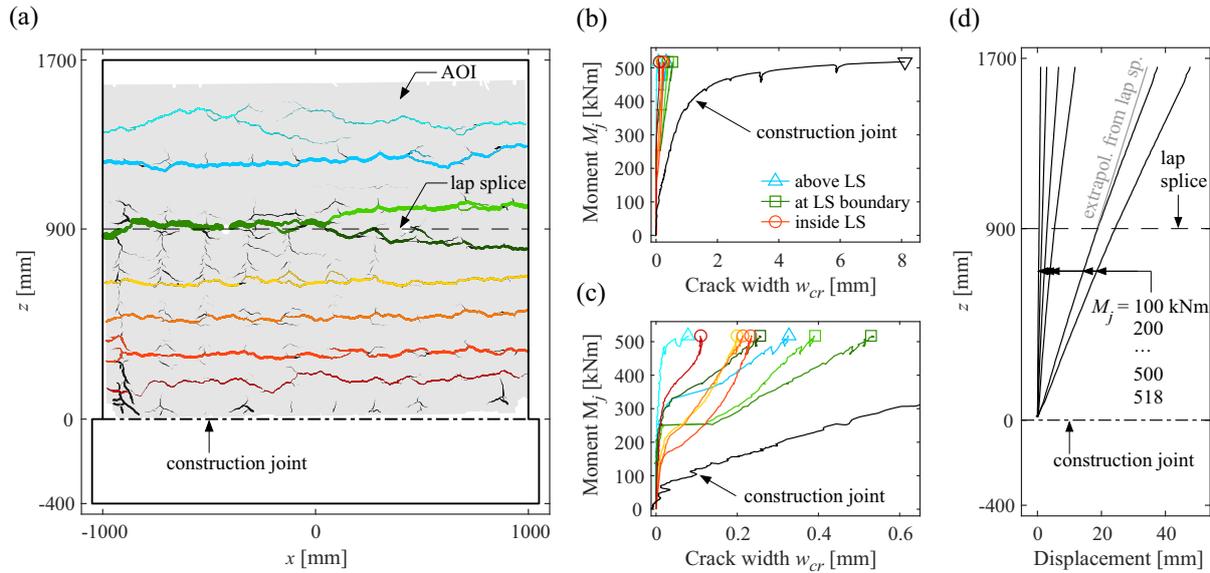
Crack widths and deformations of cantilever retaining walls with a lap splice (LS): (a) Specimen CD-0 with crack pattern at end of test (yellow and red = cracks in LS region, green = cracks at upper LS boundary, blue = cracks above the LS; line thicknesses proportional to scaled-up (36:1) crack opening; (b, c) crack openings and opening of construction joint at different scale of abscissa; (d) deflections for different load steps.
